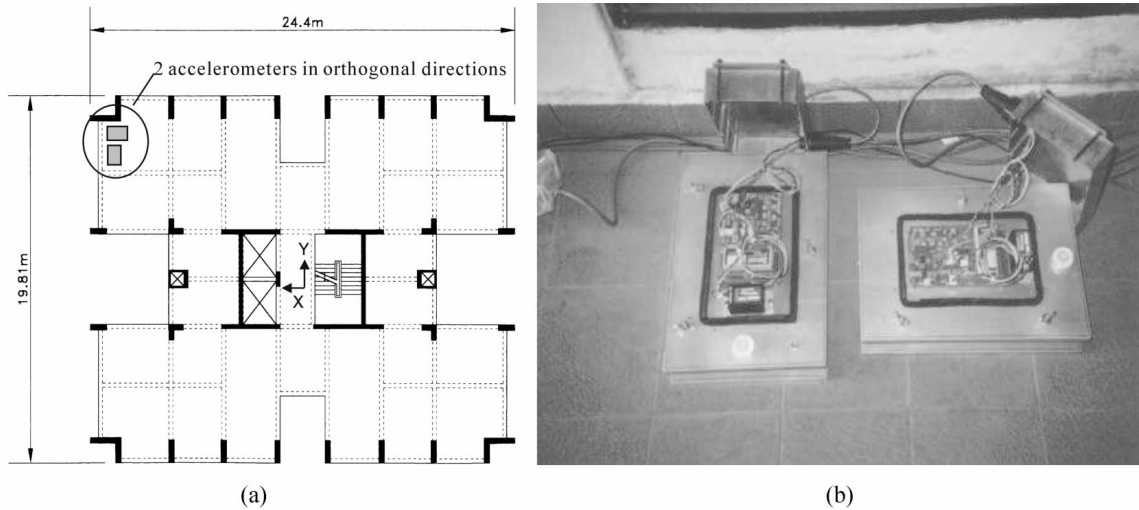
(a) Plan view of the Blk179 (b) Servo accelerometers
